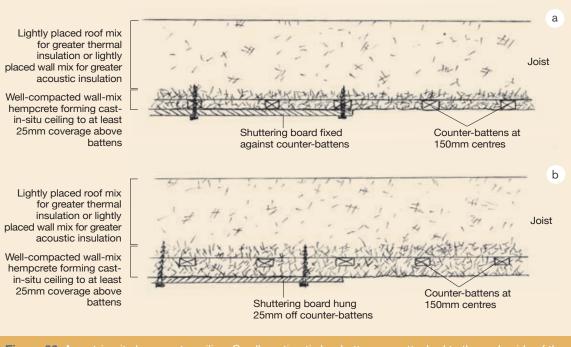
A cast-in-situ hempcrete ceiling. Small-section timber battens are attached to the underside of the joists, and the hempcrete is cast around these. Shuttering board is either attached directly to the battens (a) or hung underneath them so the battens are not visible in the finished ceiling (b).
